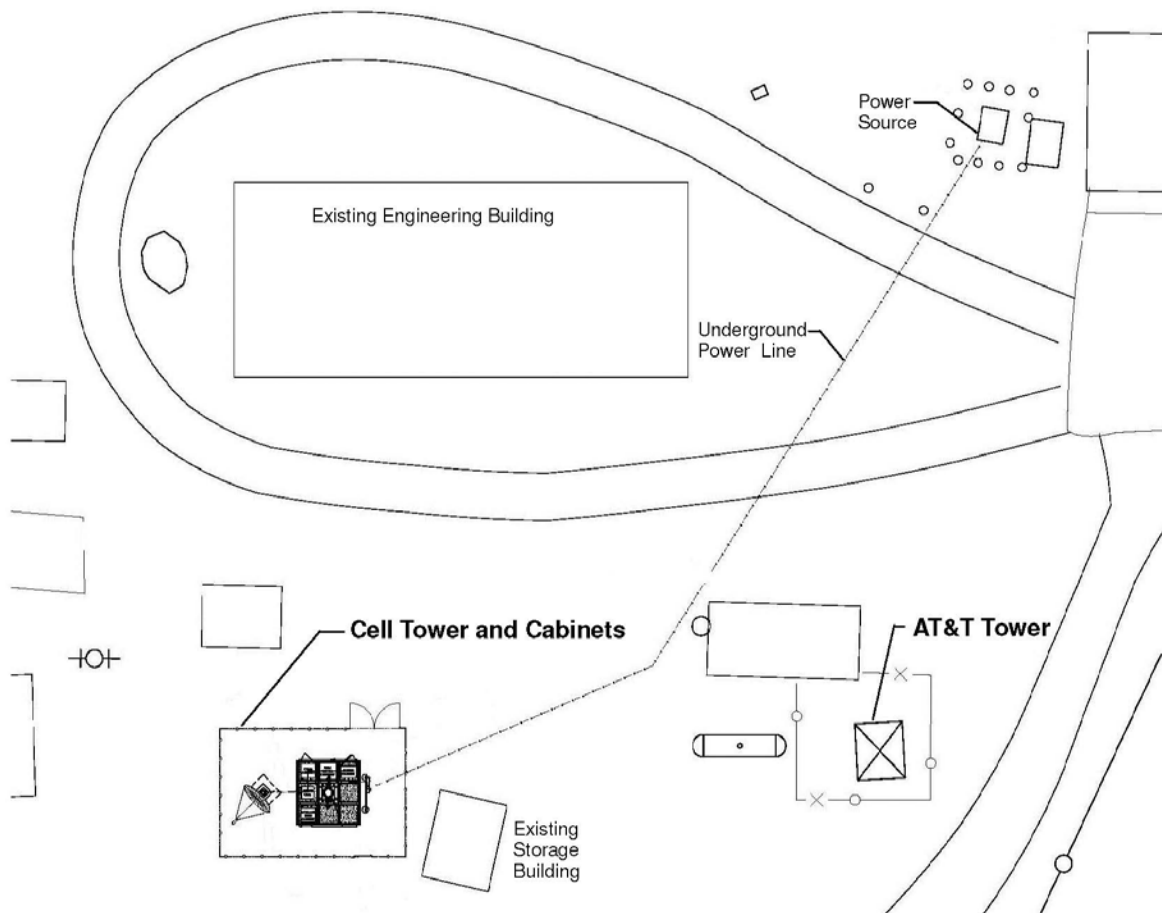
Commnet Proposed Cell Tower Project Site Plan (Underground Power Line would be New Construction)
